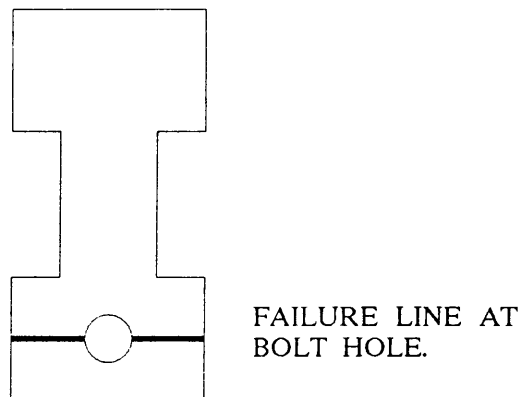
FAILURE OF SPECIMENS AT BOLT HOLES.
